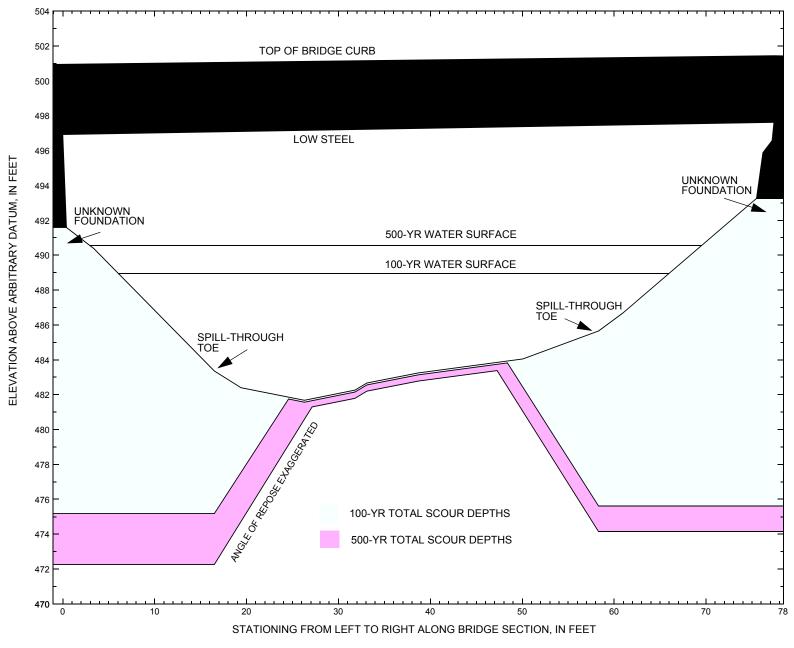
Scour elevations for the 100- and 500-yr discharges at structure JAMATH00300029 on Town Highway 30, crossing Ball Mountain Brook, Jamaica, Vermont.
